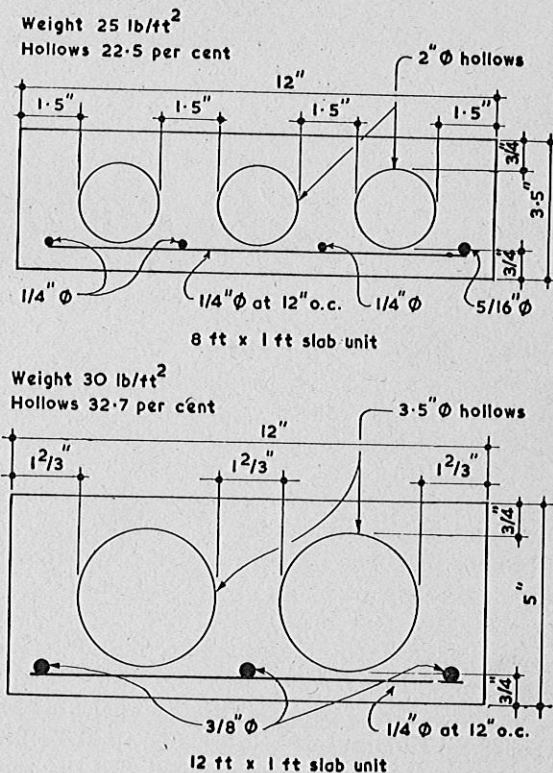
Details of the cross section of precast lightweight concrete slab units used in this investigation
